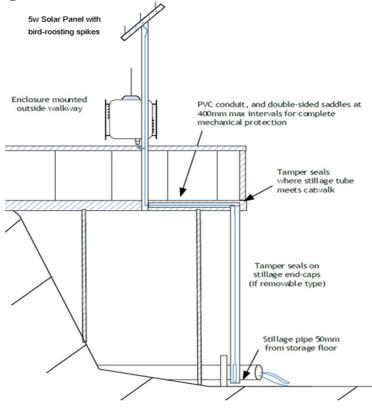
Installation Type 2 storage meter - elevated platform with a submersible pressure sensor for storage metering.
